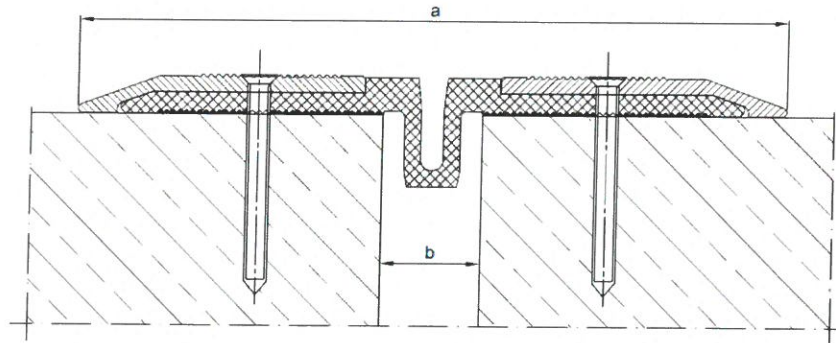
CONECTO PARK SL 190.30.N waterproof expansion joint profile – surface installation
